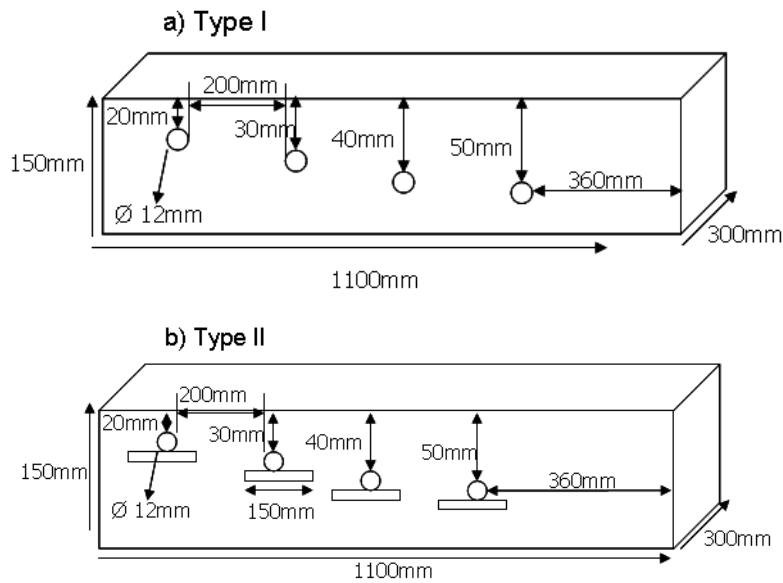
Schematic illustration of concrete slabs of a) single bar configuration (Type I) and b) two crossed rebar configuration (Type II).
